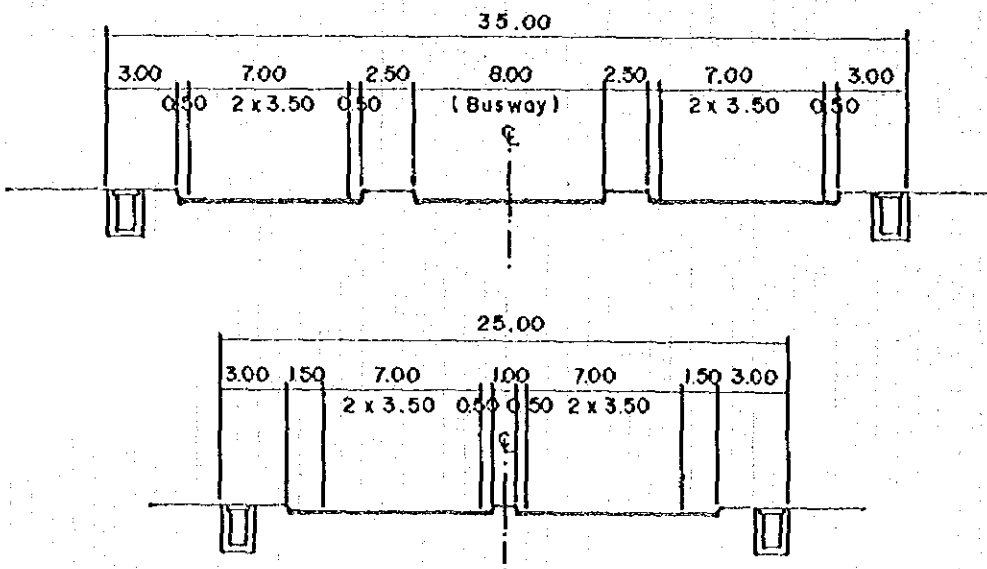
Typical Cross Section of Secondary Major Arterial Road (Type II/Class I)
